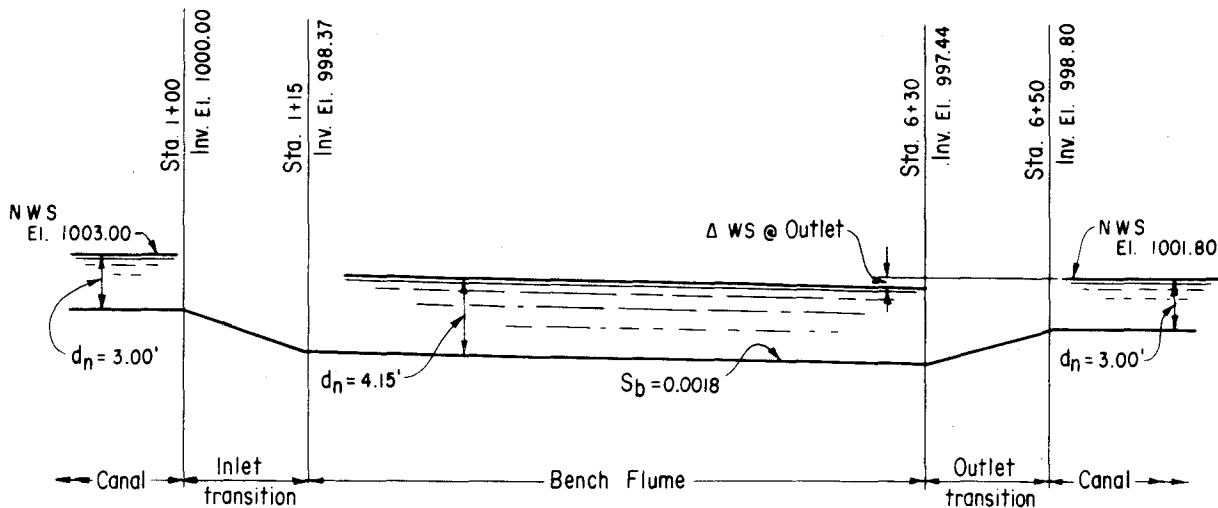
Schematic profile of bench flume. 103-D-1260
